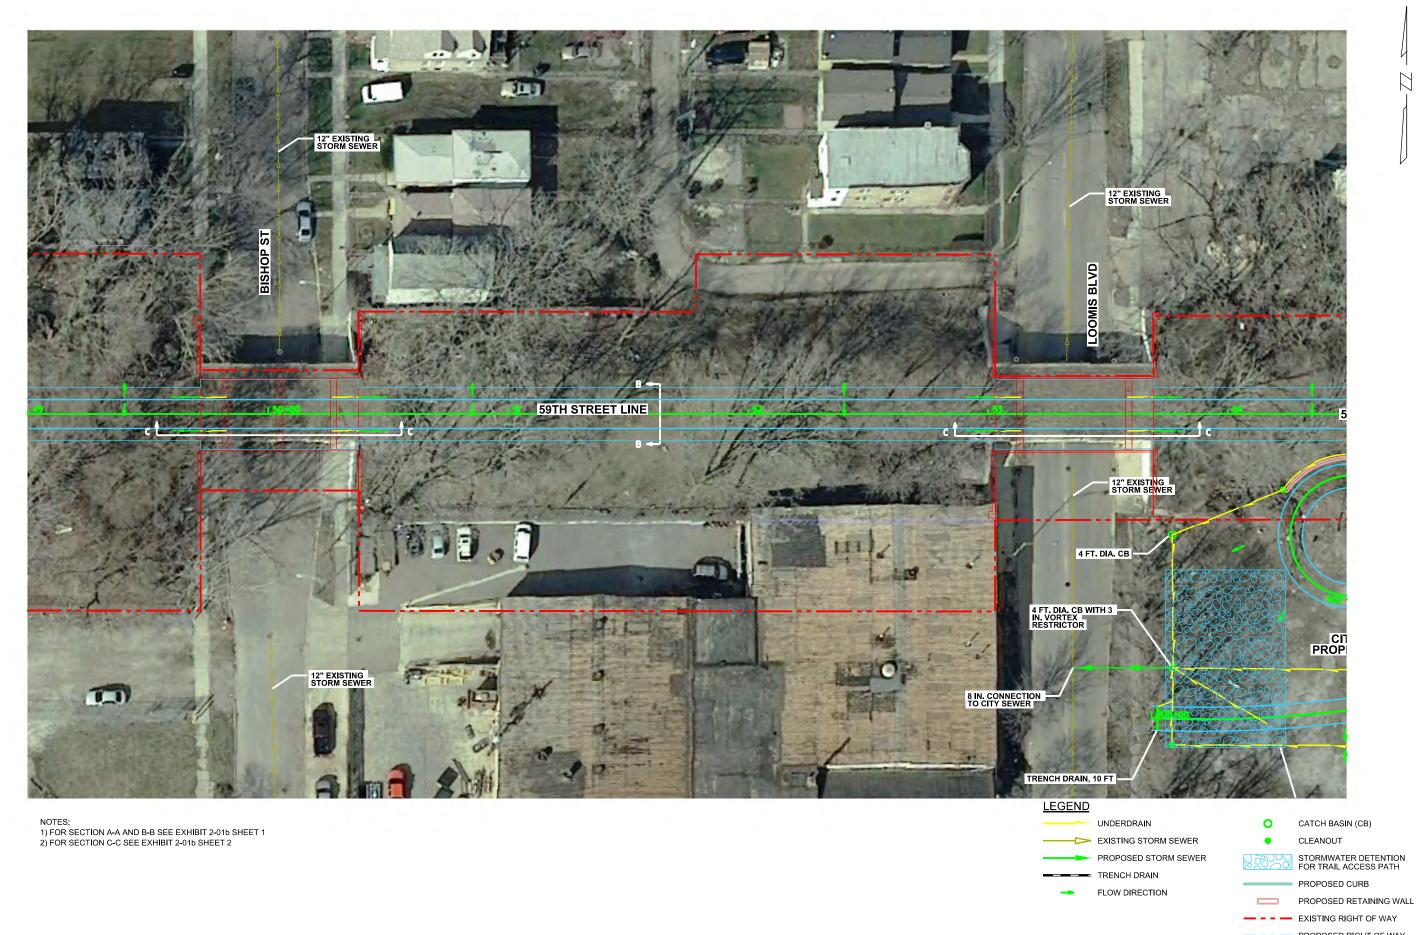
PROPOSED DRAINAGE PLAN
